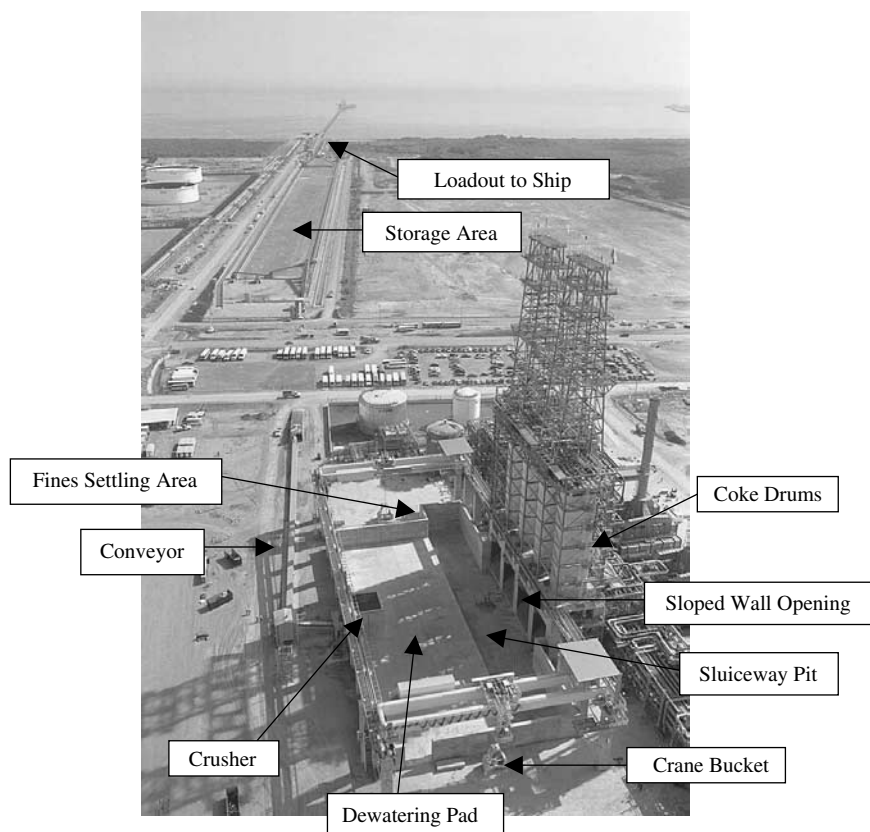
A photo of coke handling facility during construction at Petrozuata's upgrader at Jose, Venezuela.
